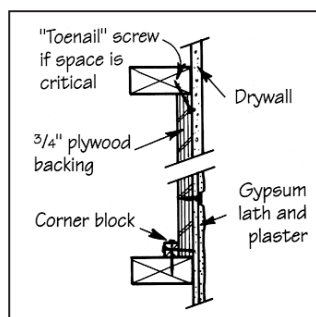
When framing a recessed opening for an appliance, the author screws a plywood backing to studs using corner blocks. He "toe-screws" directly to the studs if space is critical.
